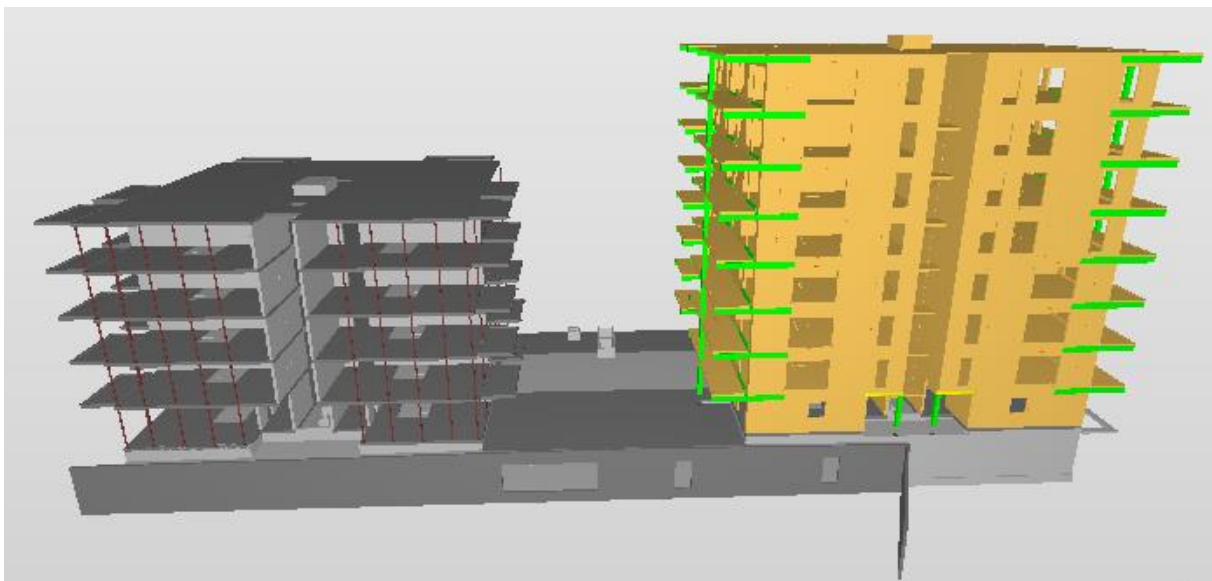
Maskinparken TRE to the right and Maskinparken 2 to the left with the concrete underground car park underneath. The picture is taken from the Solibri model of the buildings.
